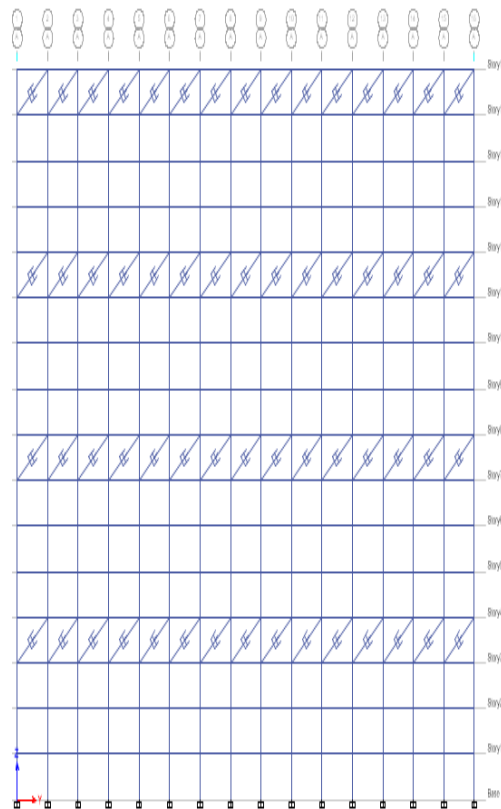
Elevation View of Rectangle bare frame With Damper(Case 3)
